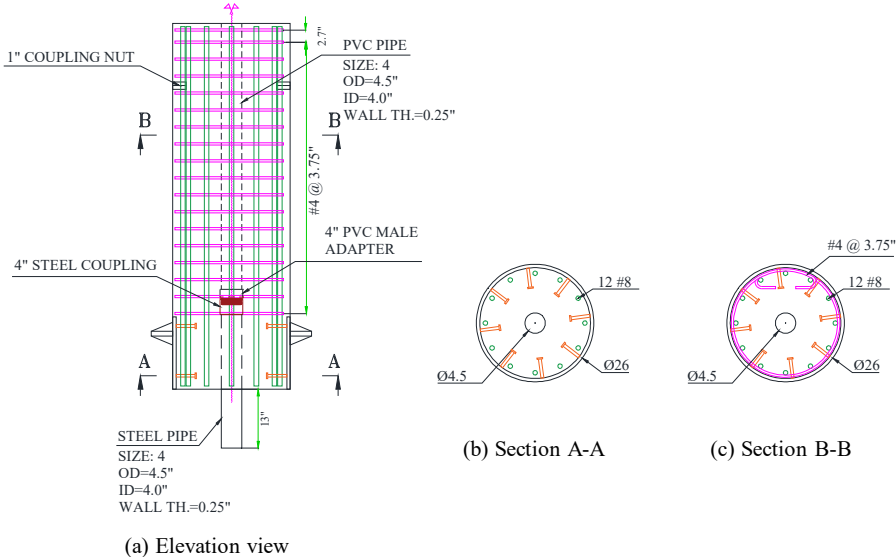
RC segment with steel collar: geometry and reinforcement details.
